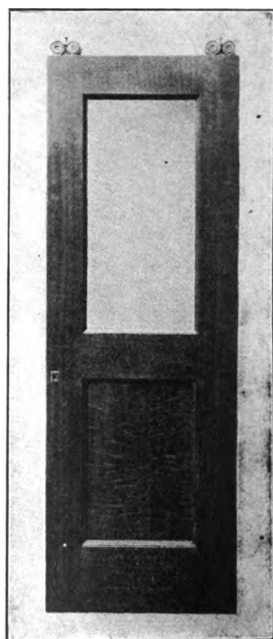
SINGLE SLIDING SASH DOOR; RESIDENTIAL SECTION, NEW YORK CITY.
